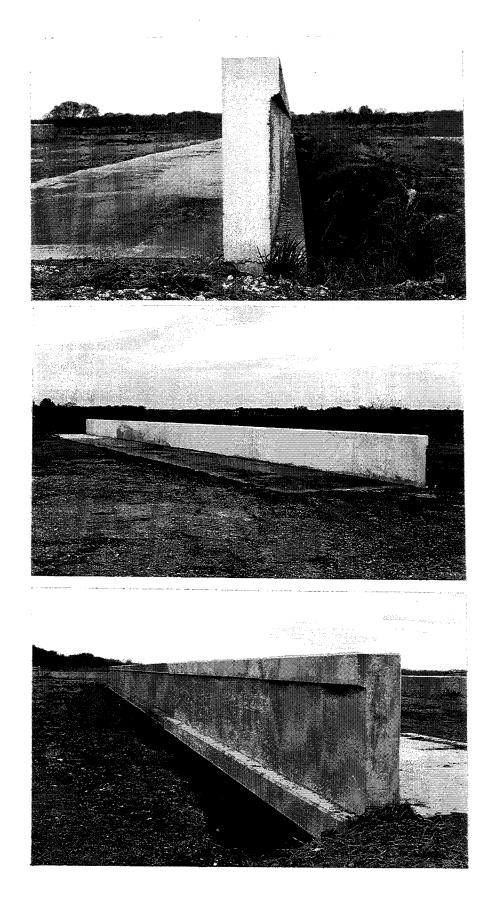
The 1.07-m vertical wall bridge railing installation before test 405511-2.
